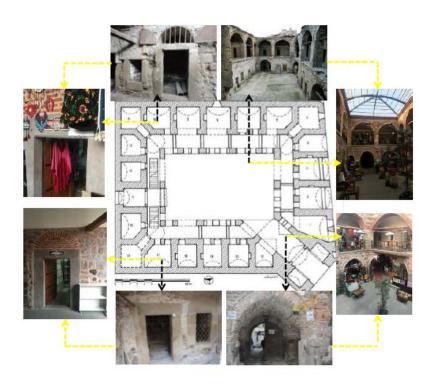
Taşhan ground floor plan (Daş,1997) and visuals for the plan diagram (Archive).
